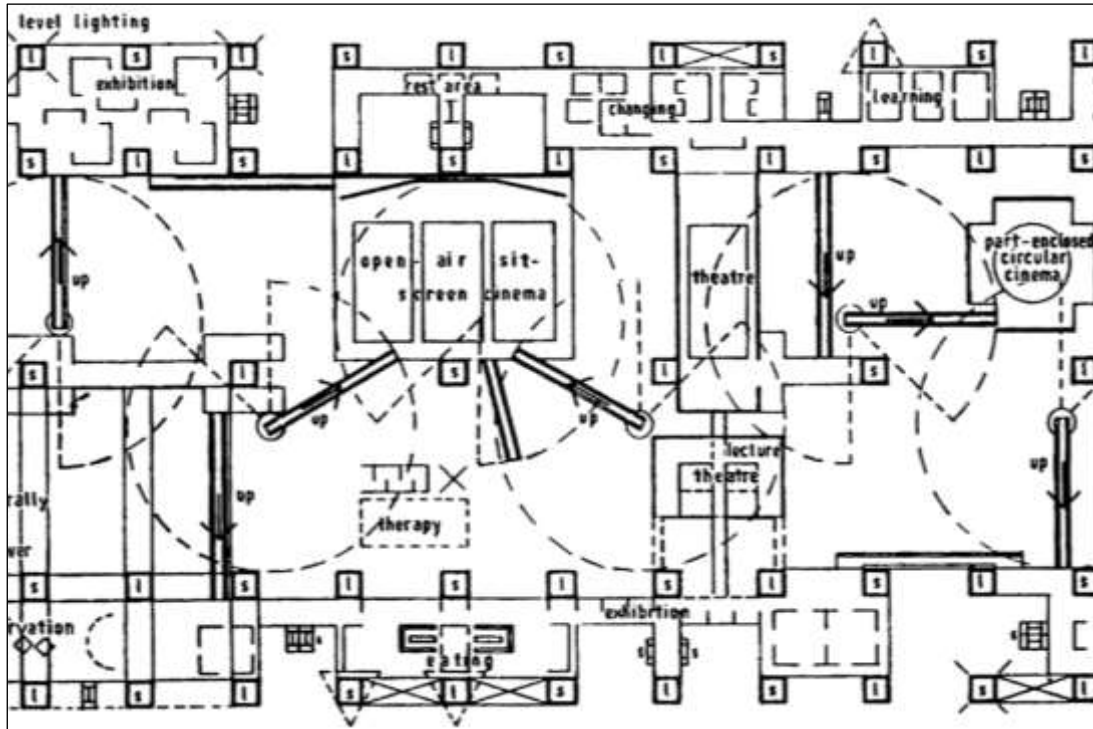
The Fun Palace Floor Plan. (Architecture (CCA), 1960).
